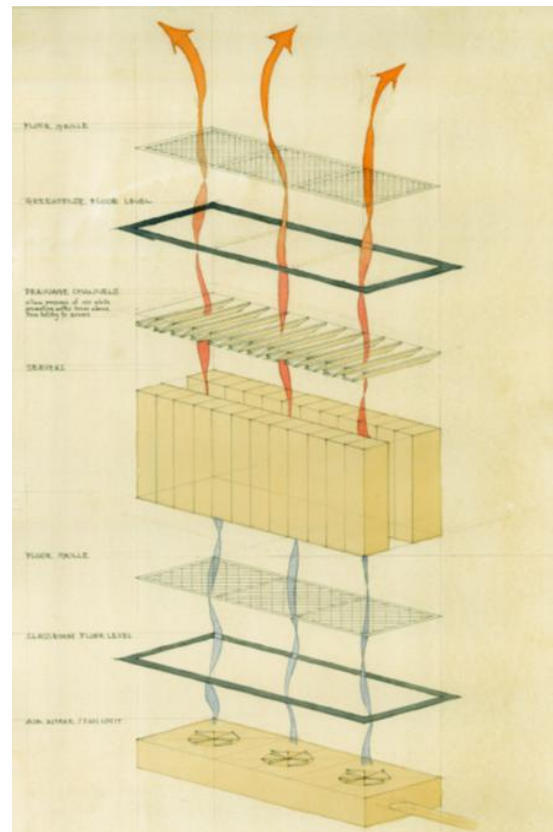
Schematic Design showing EOC design for heating a second floor greenhouse. Image: Evan Possley
